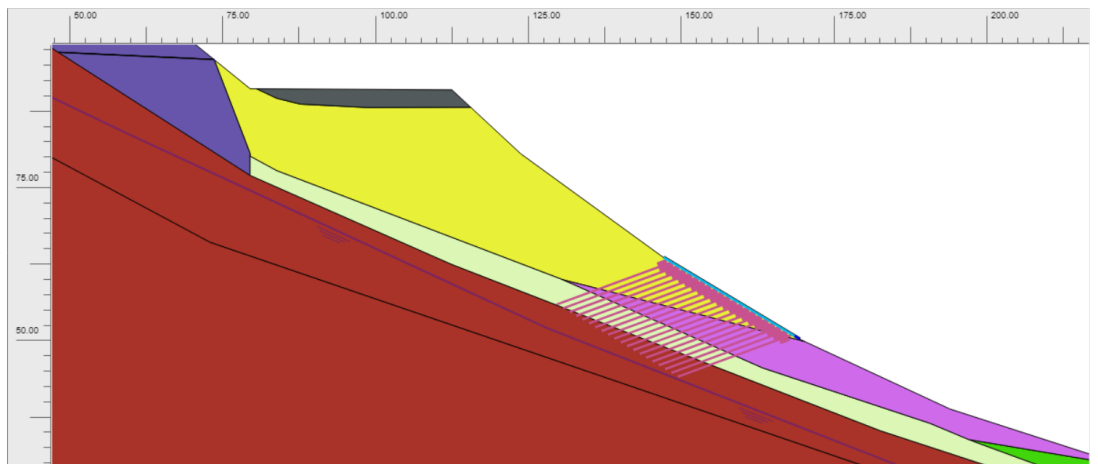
Soil Nail layout with 1.2m spacing and 20 degree inclination
